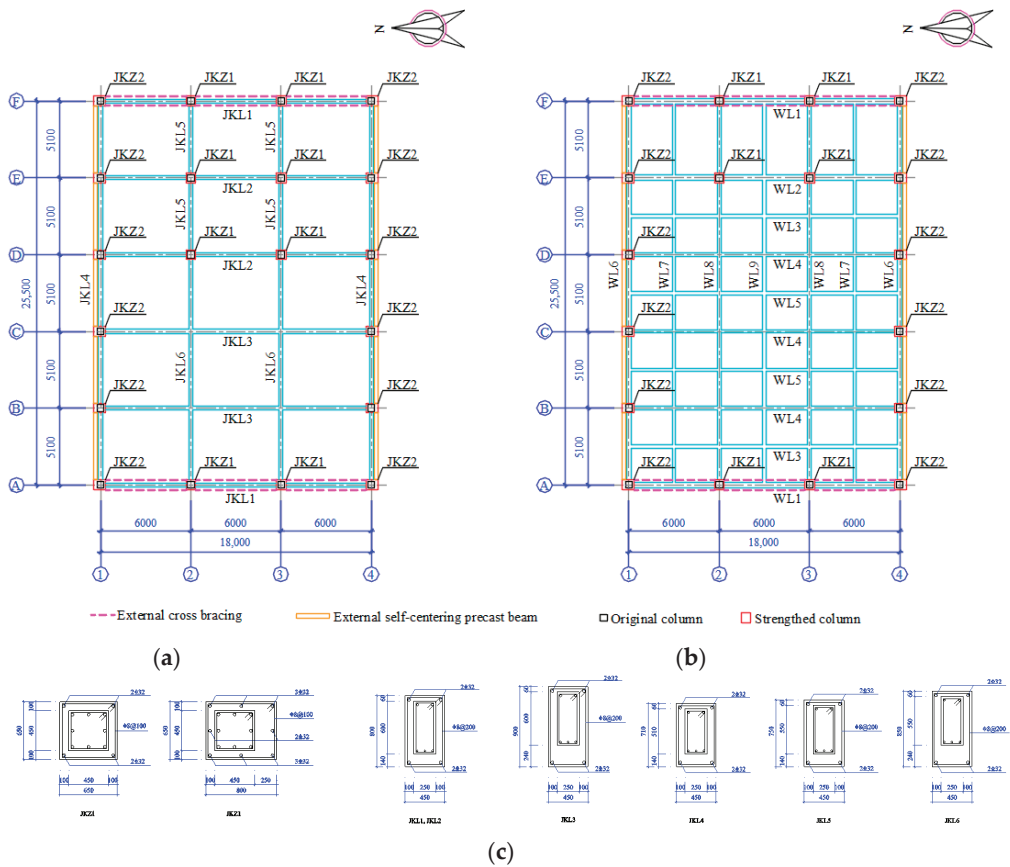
Structural plan layout of frame KJ2. (a) Plan layout of the first to the third storey; (b) Plan layout of the fourth storey; (c) Cross-sectional dimensions of beams and columns.
